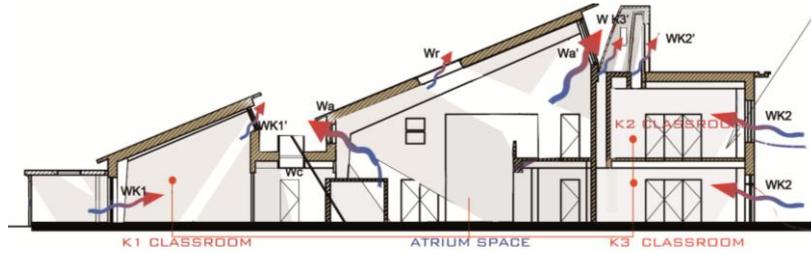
Natural ventilation in section- inlets and outlets (drawn by author)
